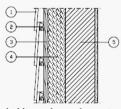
Rain-screen-cladding scheme. I exterior facade panels, 2 cavity for air circulation, 3 subframing, 4 PUR heat insulation, 5 exterior wall.
